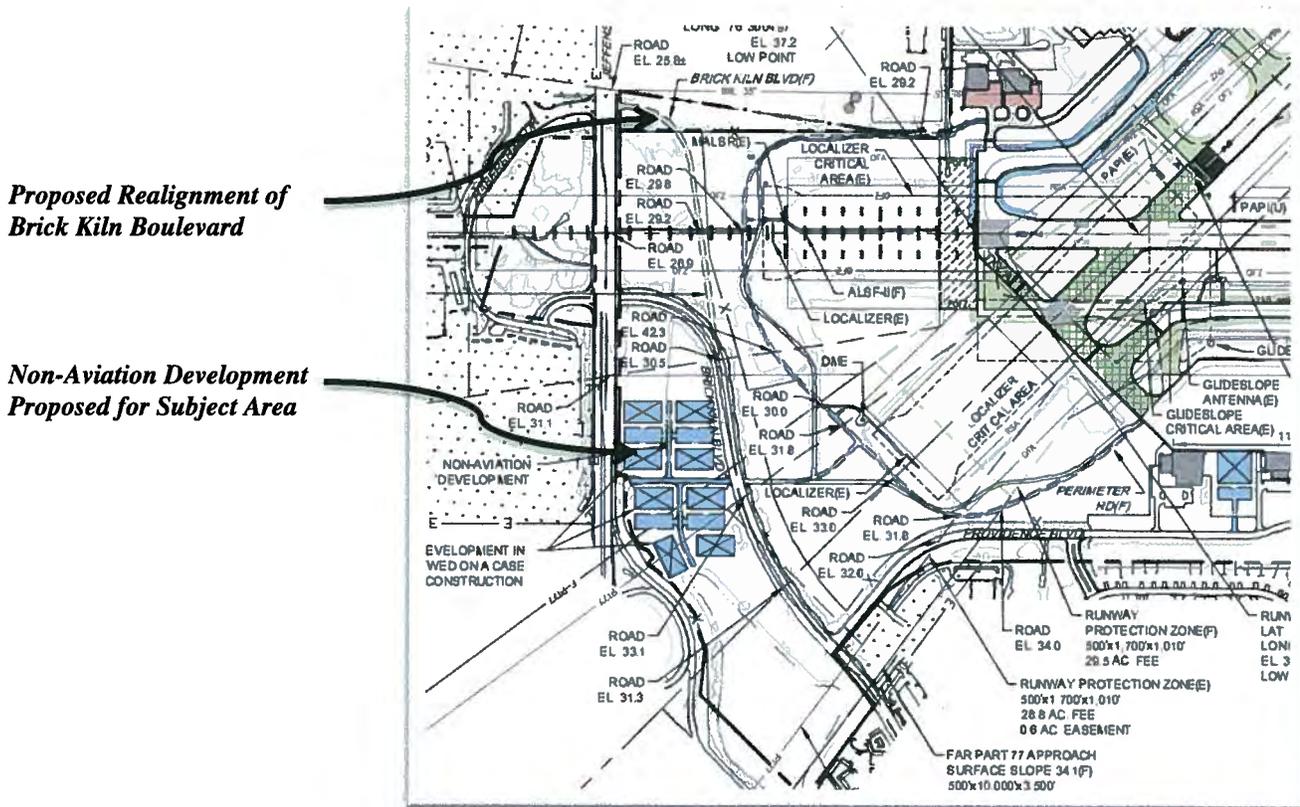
The Airport Layout Plan illustrates non-aviation development in the subject area and realignment of Brick Kiln Boulevard (excerpt from Sheet 3 of the FAA approved Airport Layout Plan).
